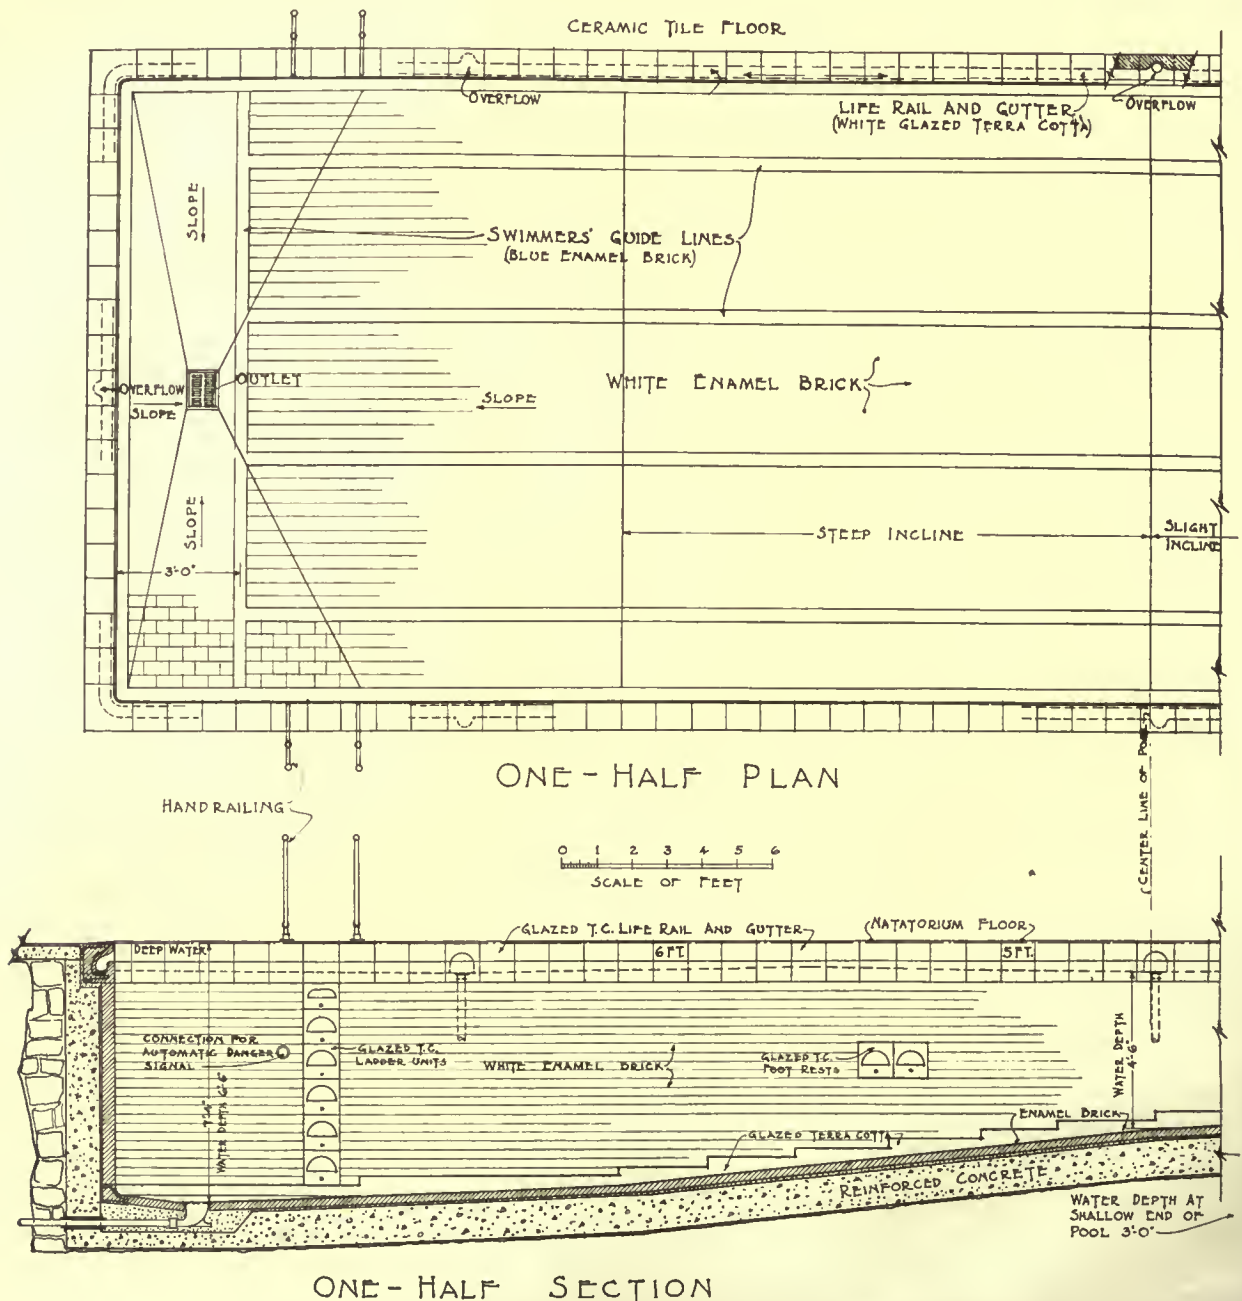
Half plan and longitudinal section of a typical swimming pool.
